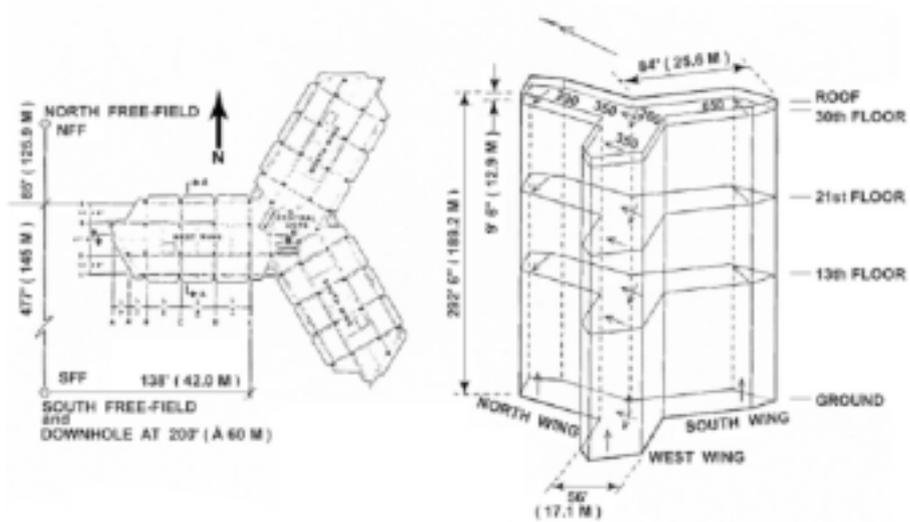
General Layout and Instrumentation Scheme of Pacific Park Plaza, Emeryville, Ca.
